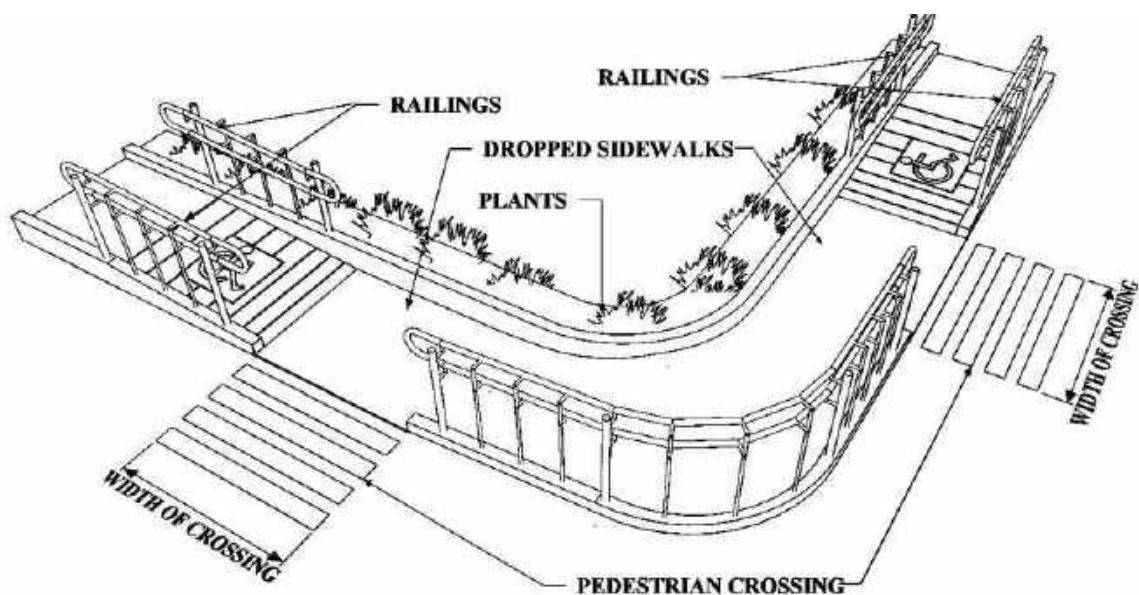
Perspective View of a Dropped Sidewalk at a Street Corner
